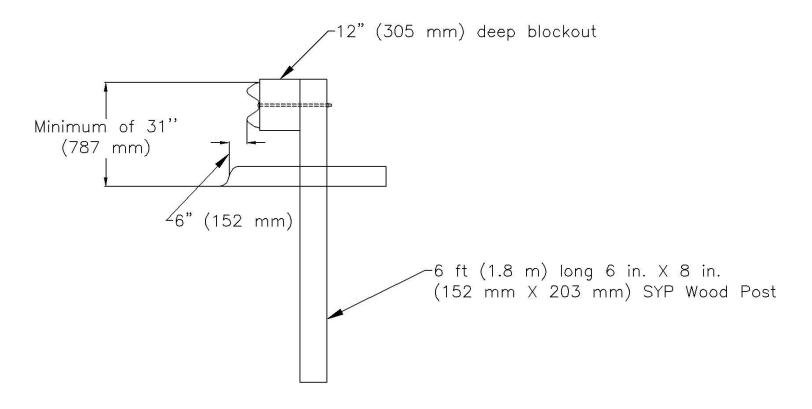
SYP Wood Post MGS Adjacent to Curb Cross-Section
